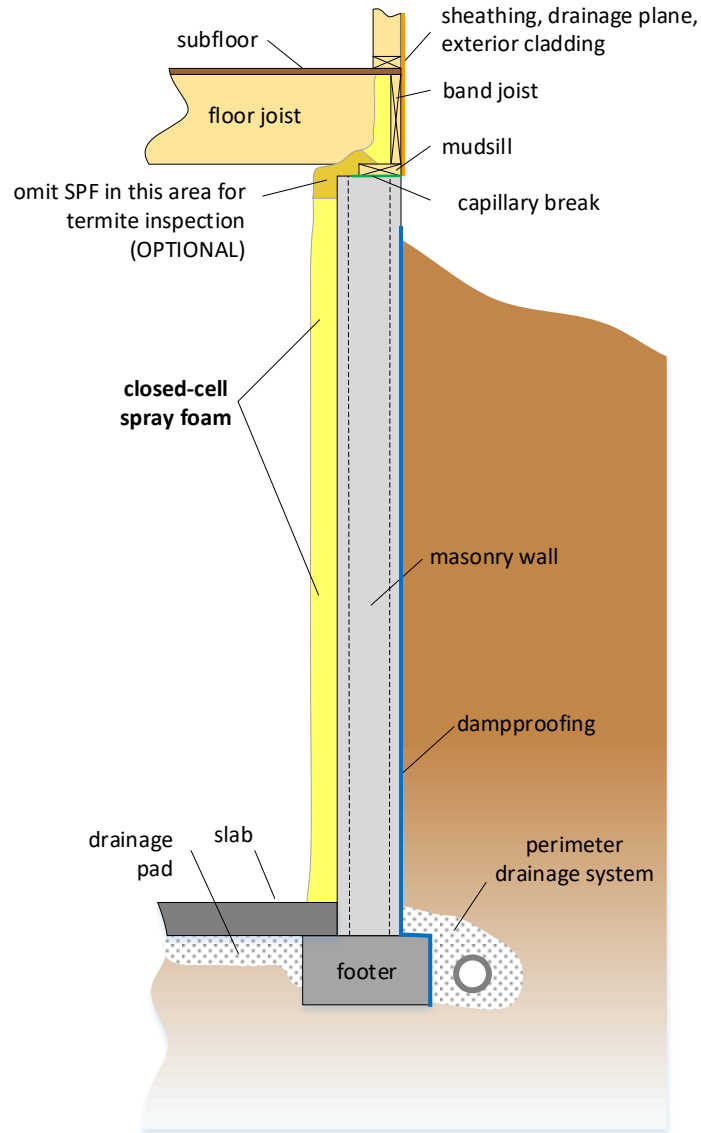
Fully-Adhered SPF to Dry Masonry/Concrete Basement Wall (diagram)
